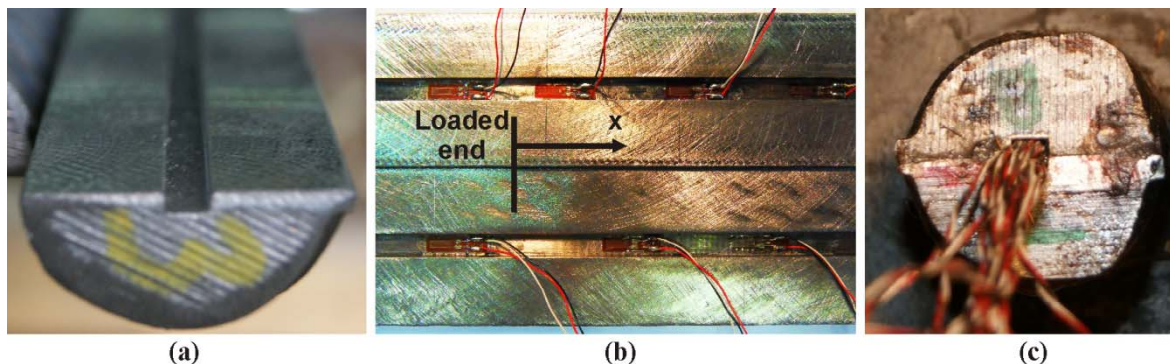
Internal instrumentation, (a) half bar milled and grooved, (b) typical gauge arrangement of bar ER1, (c) wires at glued bar end
